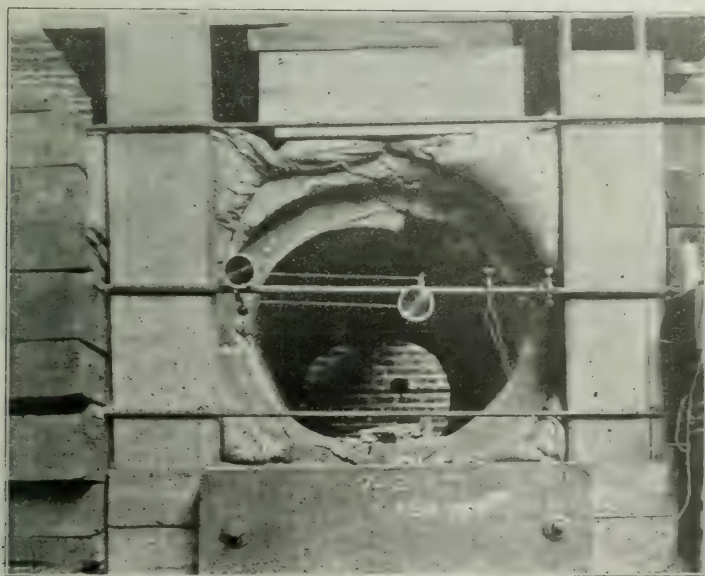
View of Reinforced Concrete Pipe After Test.
